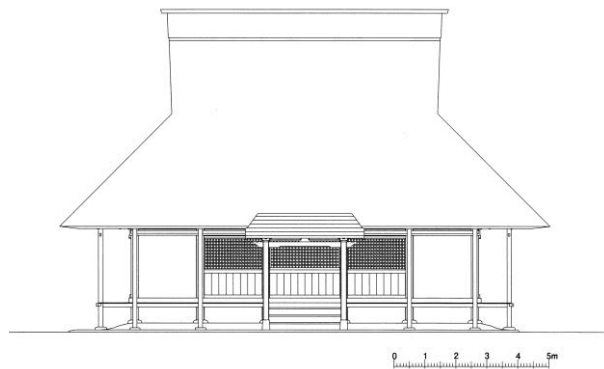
shows one-story wooden structure with thatched roof, Yakushi-doh structure, which was built an old Japanese traditional framed-construction method and have a thatched roof instead of tile. Yakushi-doh structure was dedicated in 1617 to deity “Bhaisajyaguru”, who has been believed in a Buddha able to cure all ills, and has been an important cultural asset. Figure 1 indicates floor plan, elevation one, and cross section ones of Yakushi-doh structure. The width, depth, and height of Yakushi-doh structure are 13.211m, 11.756m and 10.254m, respectively. Photo 2 shows a post erected on a foundation stone under Yakushi-doh structure floor. There are many posts erected on their foundation stones with flat plane under Yakushi-doh structure floor, and they are not fixed on their foundation stones. Consequently, this system is likely to be a seismic base isolation. In this paper, the effect of the post fixing condition under wooden structure floor on seismic response of Yakushi-doh
